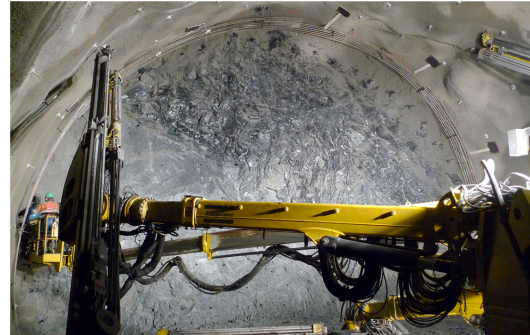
Ready-mounted rebar for the application of sprayed concrete. The light and dark plywood plates serve as protection for the instrumentation wiring during sprayed concrete application. The tunnel width is 15.5 m (the tunnel profile was extended to make room for the RRS)
